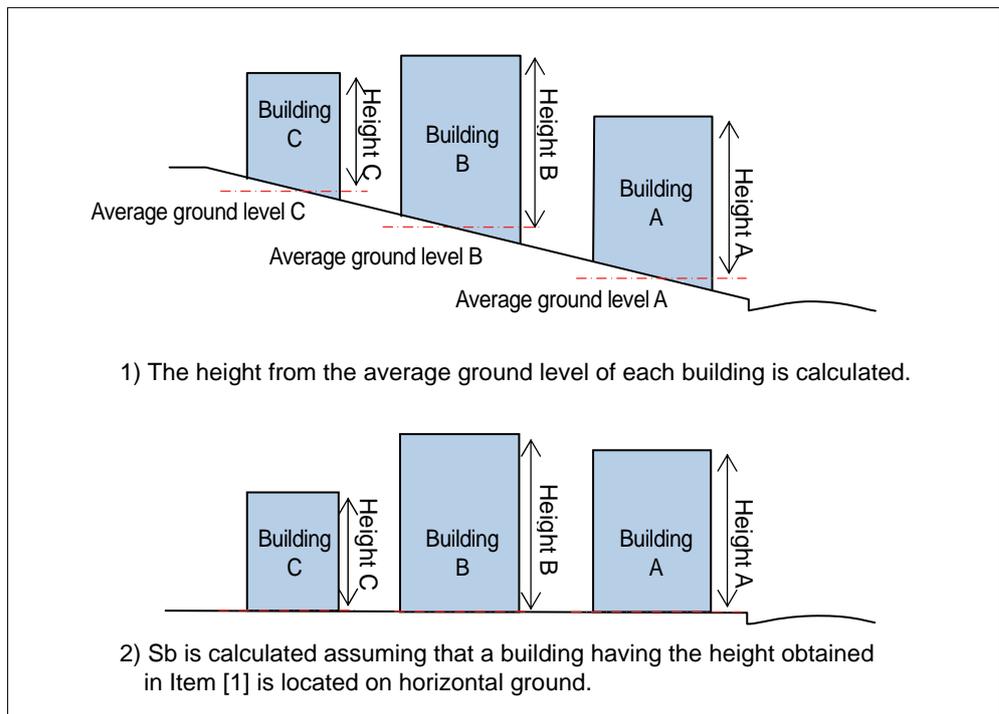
Calculation of the exposed area in cases when multiple buildings are located on a slope
